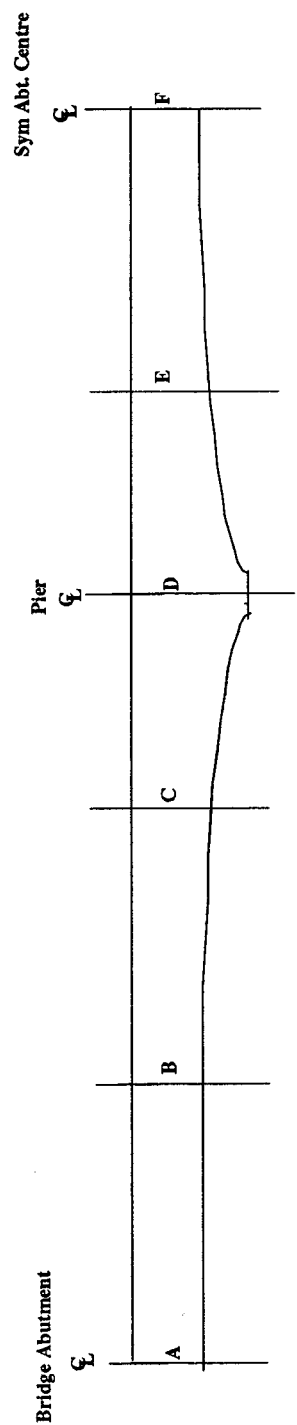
Plan and Elevation of FHWA-No.2 Example Bridge.
